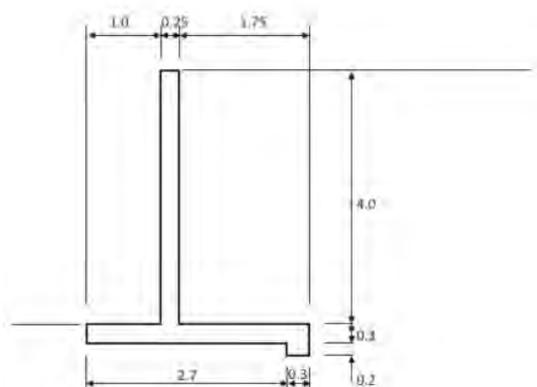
Wall details for example comparing M-O and LimitState:GEO solutions.
